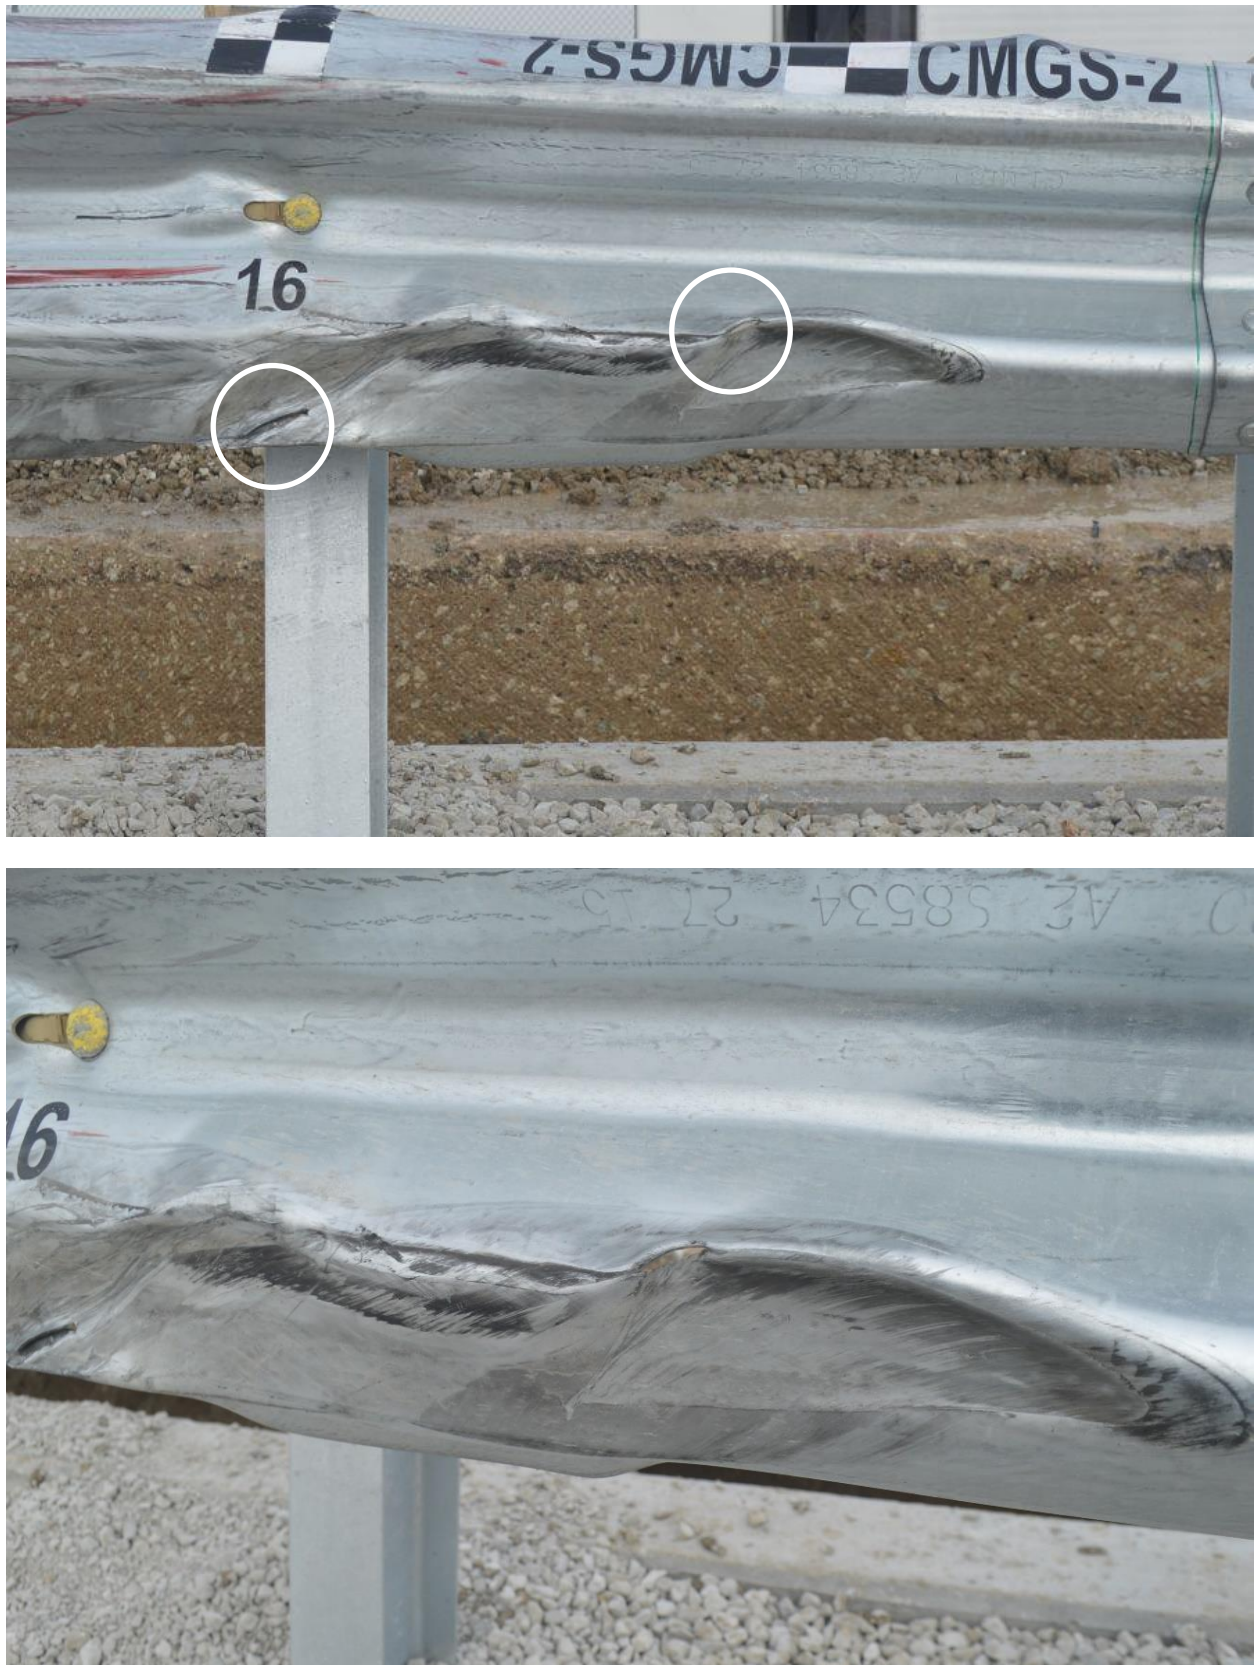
Rail Tears at Post No. 16, Test No. CMGS-2
